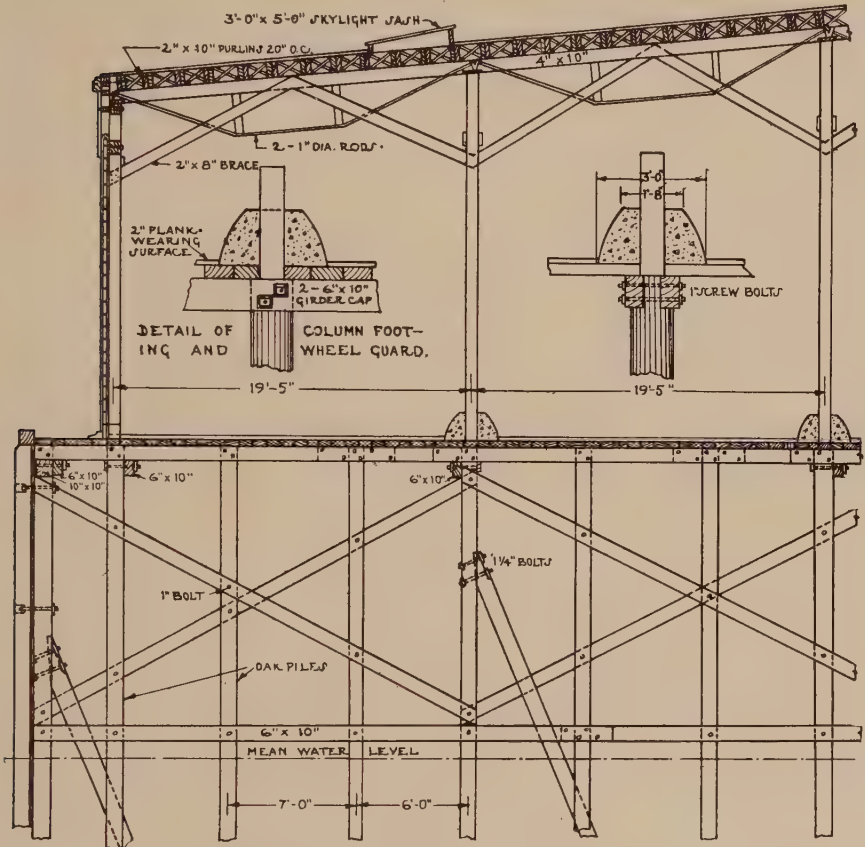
Typical cross-section through Commonwealth Pier at South Boston.
